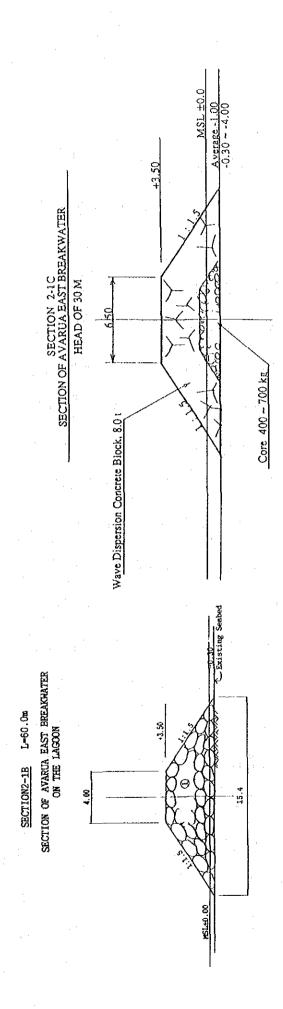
Typical Section, Avarua Harbour, (1/5)
